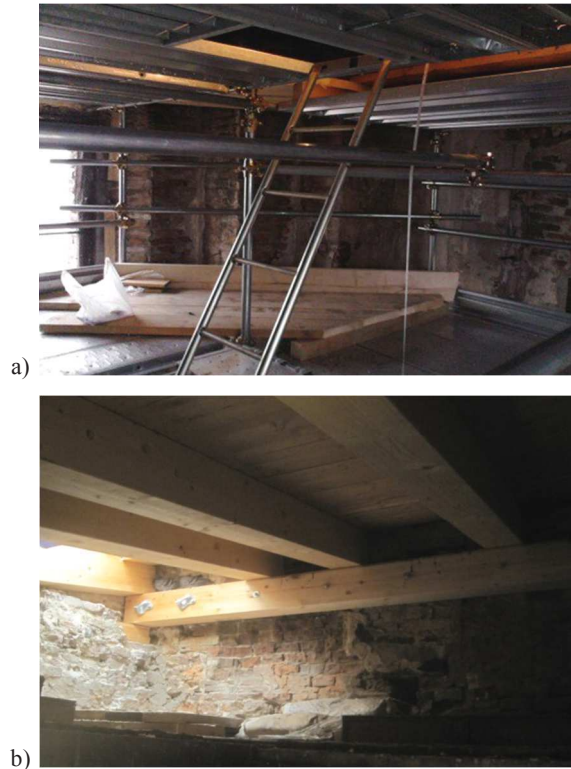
Details of the added provisional scaffoldings (a) and wooden roof (b)
